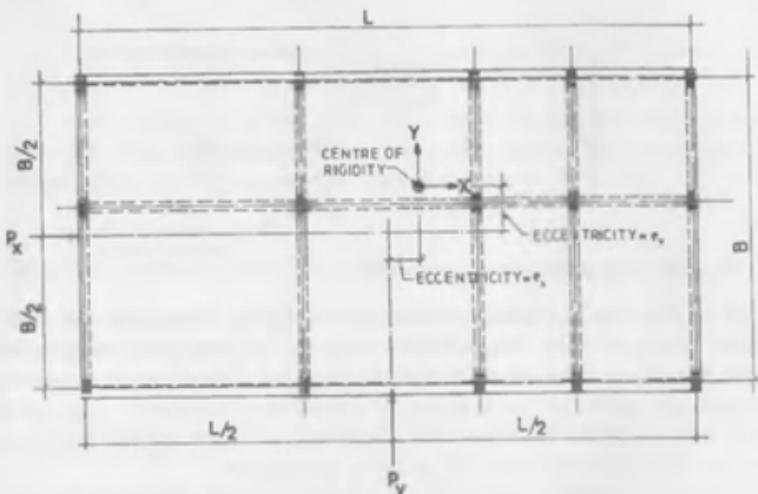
Floor diaphragm under eccentric horizontal shear.
